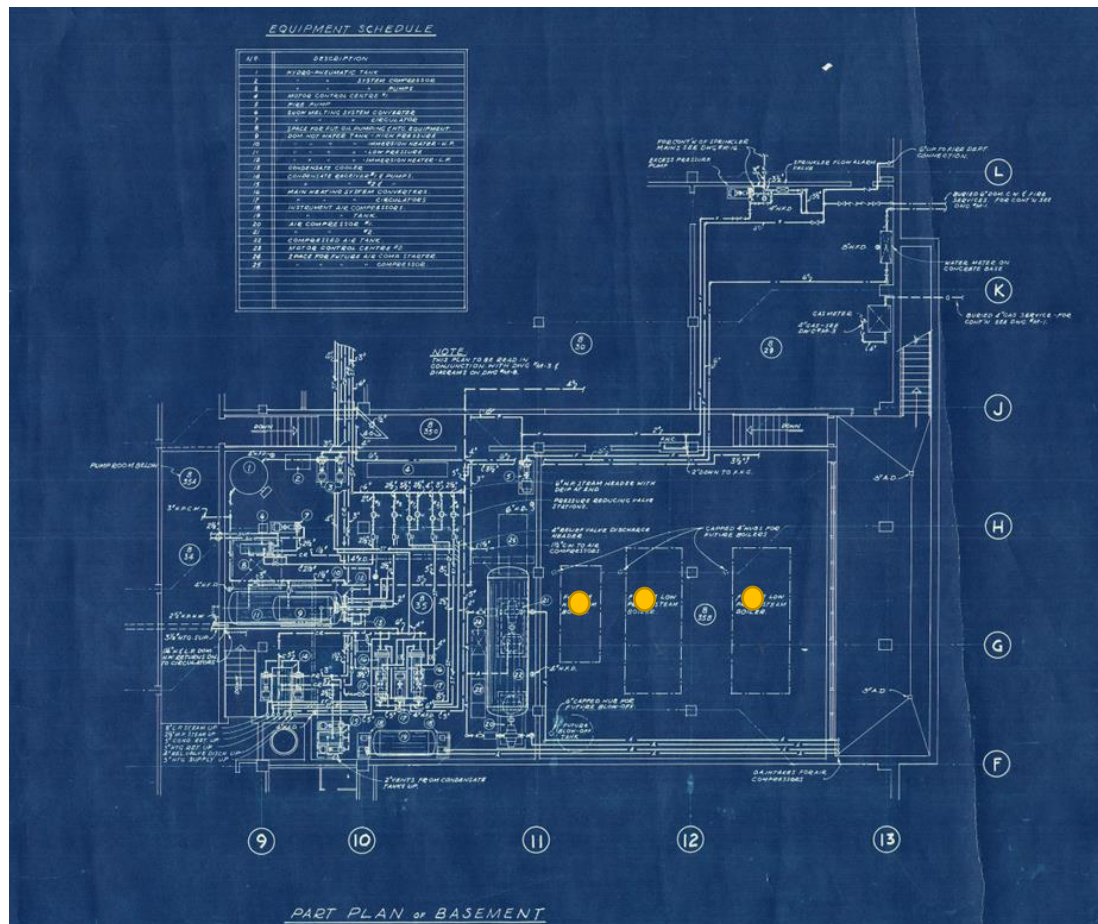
Original 1958 Building basement mechanical room – proposed locations of steam boilers and exhaust marked in yellow
